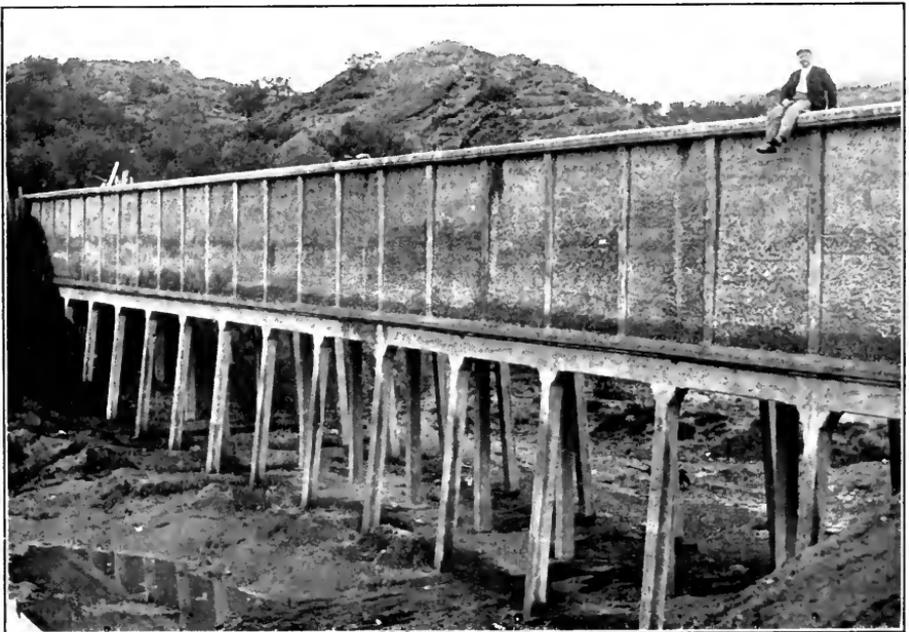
FIG. D.—Reinforced concrete flume. Faleva Flume, Spain.
